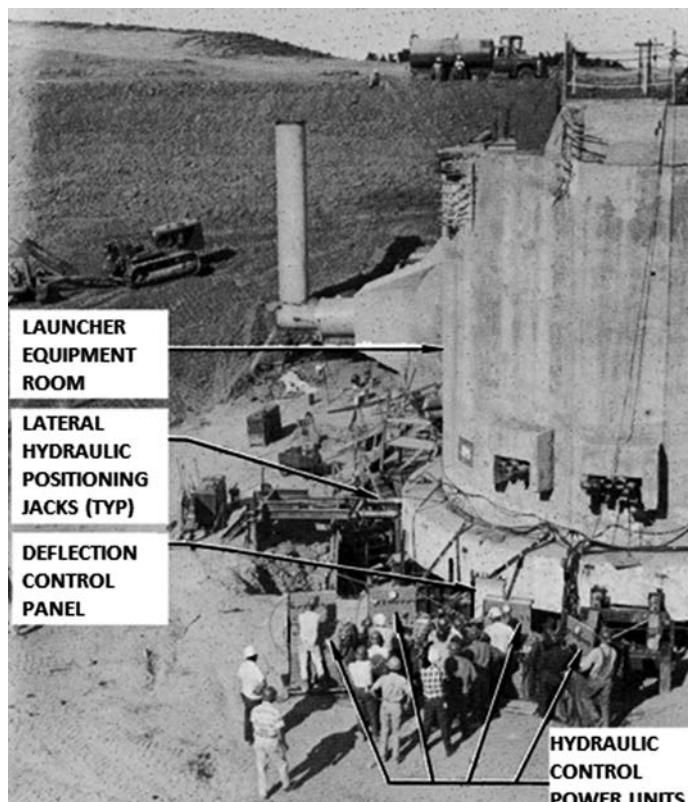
During construction at Grand Forks AFB two of the launcher equipment rooms settled beyond specifications. The structures were excavated and repositioned using massive hydraulic jacks. A similar technique was used to repair LF-28. (Courtesy of Boeing Company.)
